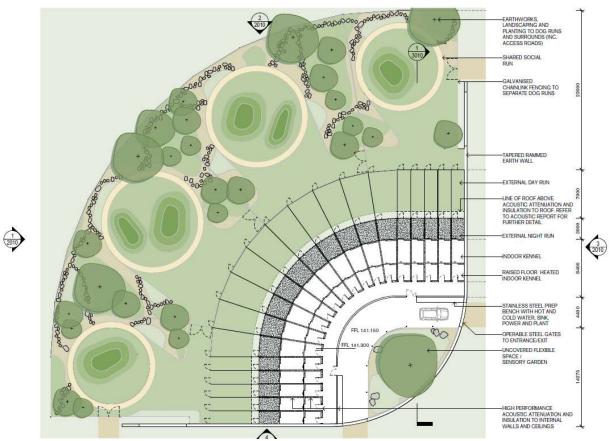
Typical Kennel Plan (Proposed Plans, Tzannes)
